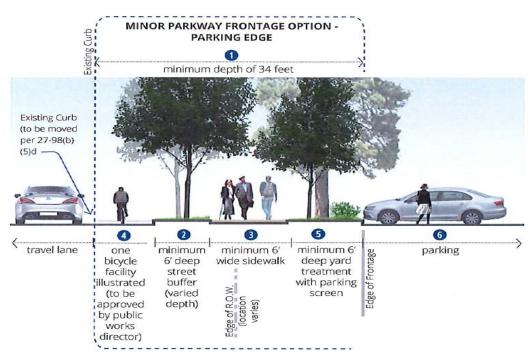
Minor Parkway Frontage Option - Parking Edge
